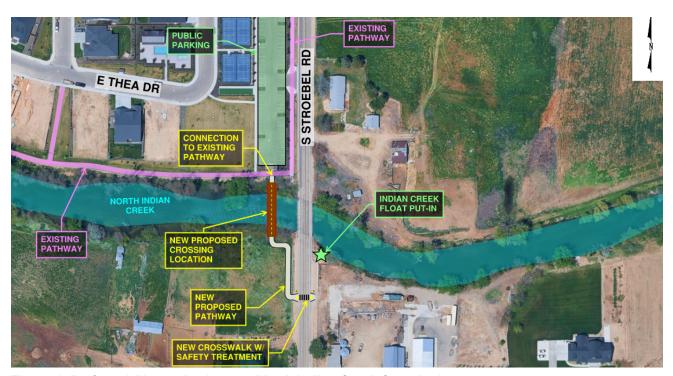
Preferred Alternative Layout (North Indian Creek Crossing)
